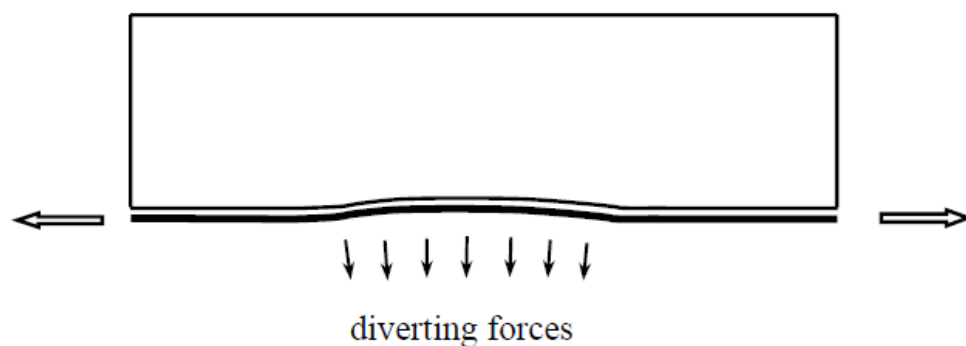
Delamination caused by tension failure of the concrete cover.
